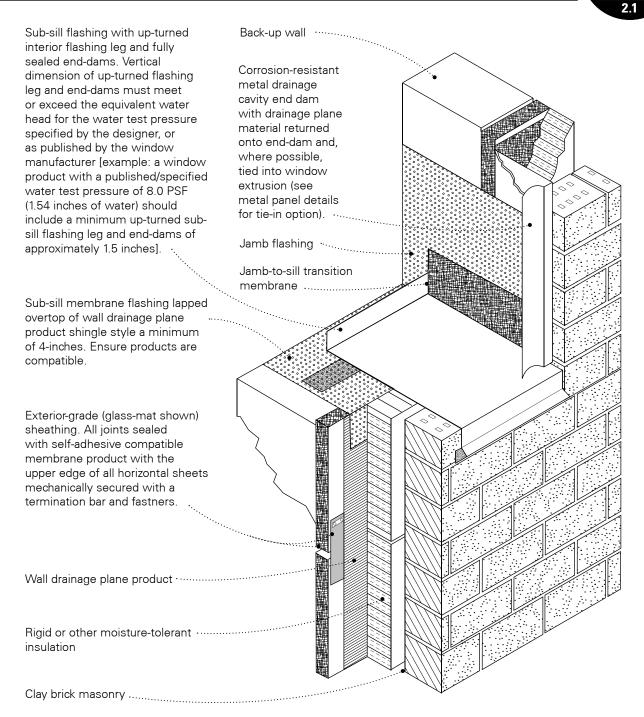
Q Window Construction—Sill to Jamb Corner Adapted from Weber (2009); used with permission from the National Institute of Building Sciences.
